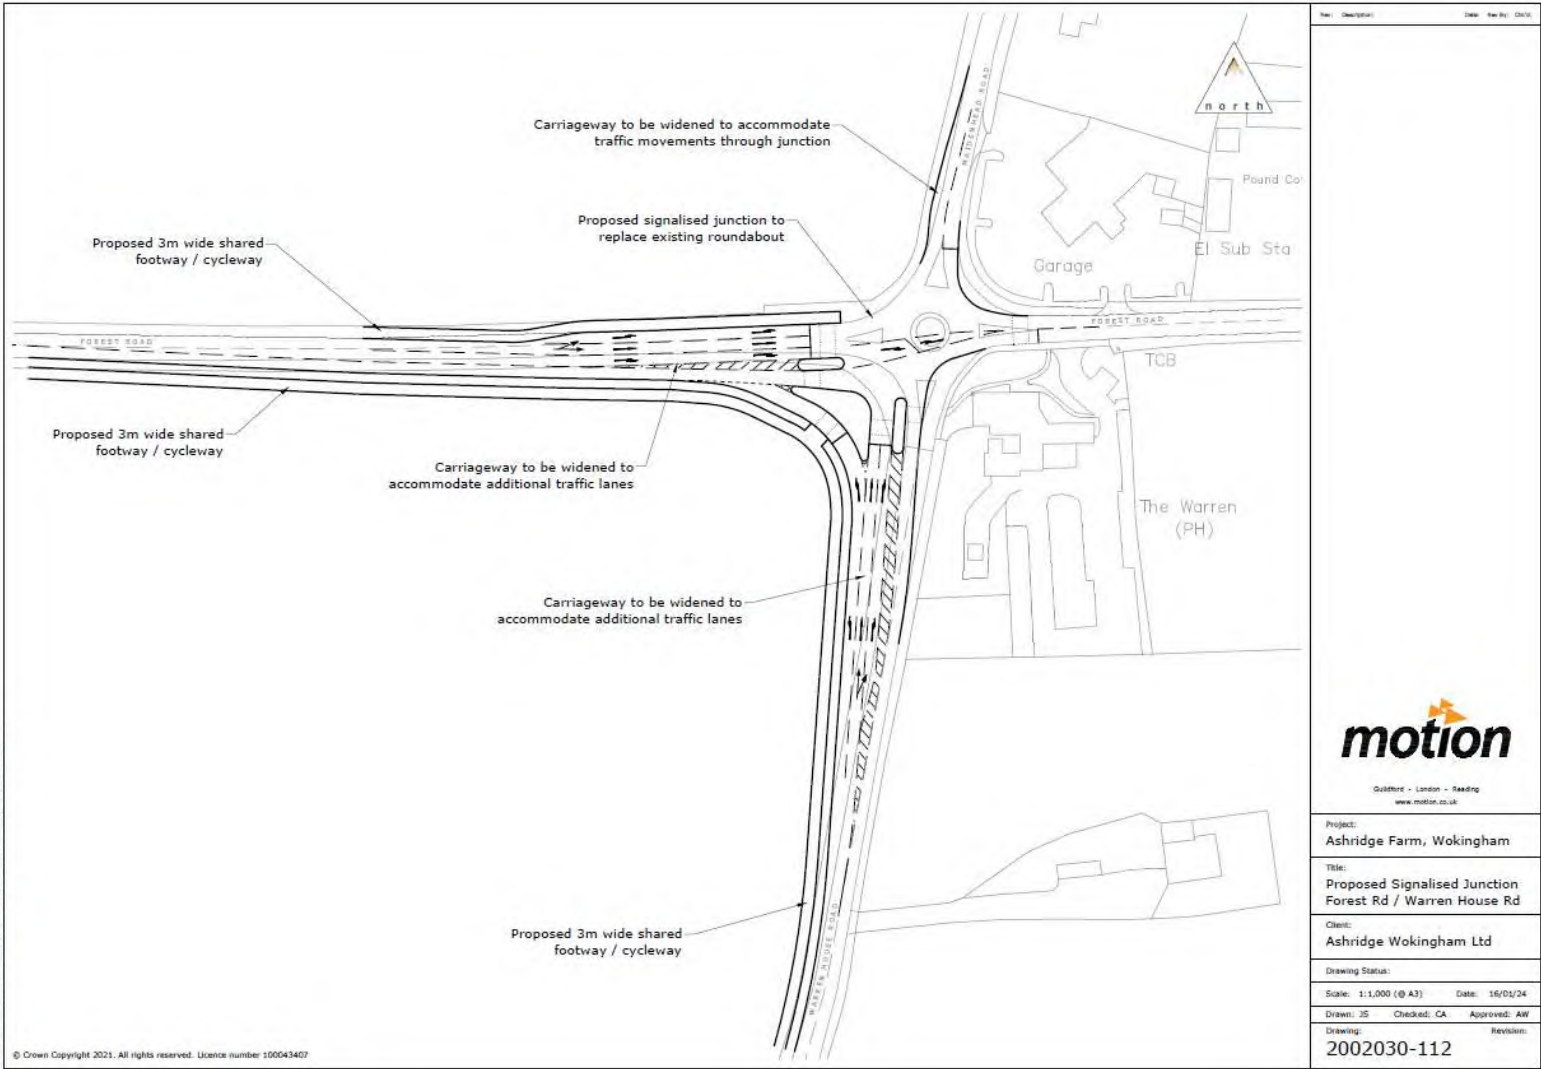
Proposed Signalised Junction at Forest Rd / Warren House Rd
